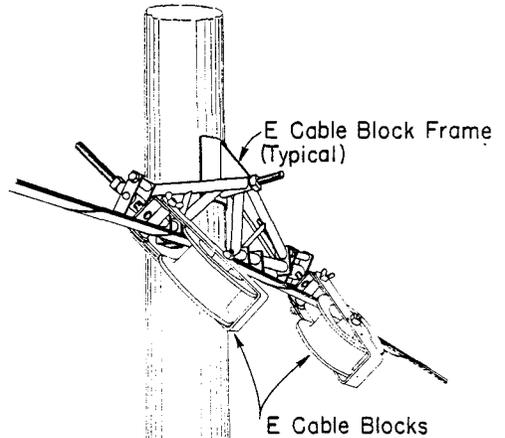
E Cable Block Frame (With E Cable Block Installed)
